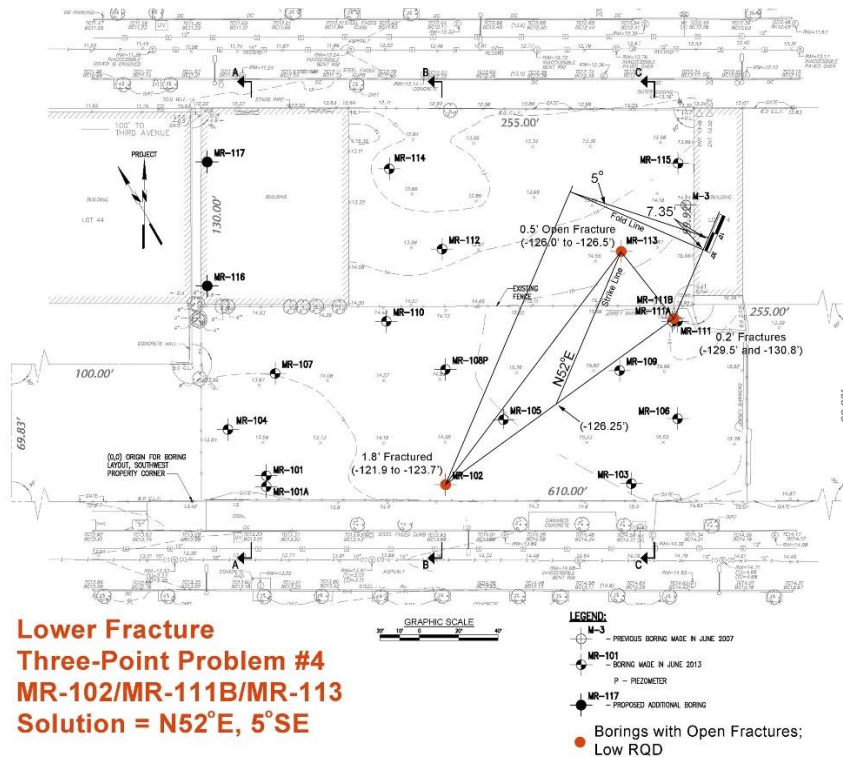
Solution #4 for lower fracture. (Borings MR-102, MR-111B, and MR-113.)
